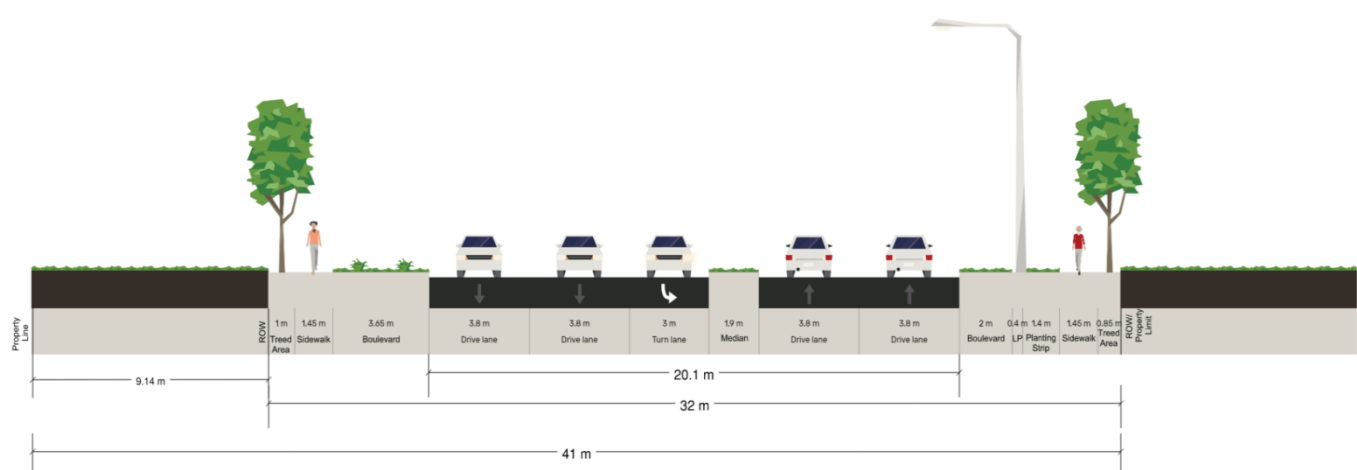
EXISTING CROSS-SECTION, WEST OF GRENOBLE BLVD
